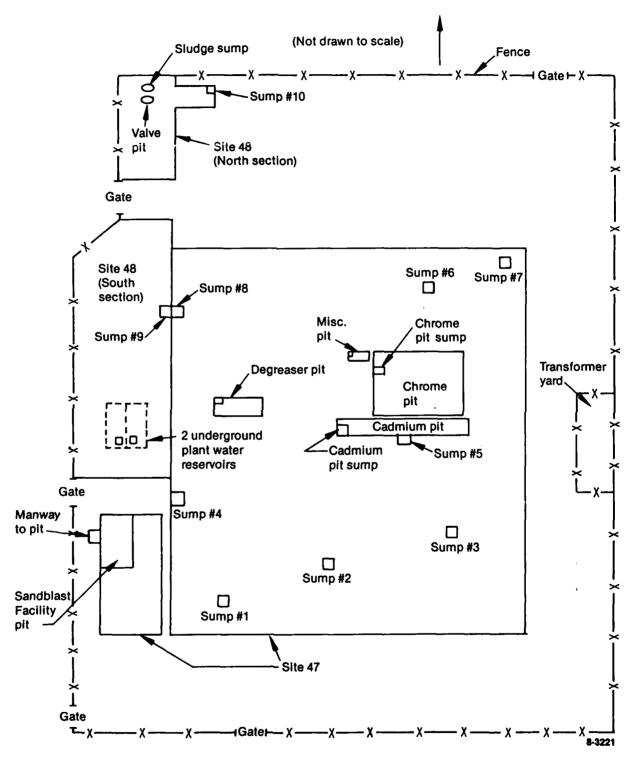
Sites 47 and 48 showing approximate location of sumps, pits, and openings to underground plant water reservoirs.
